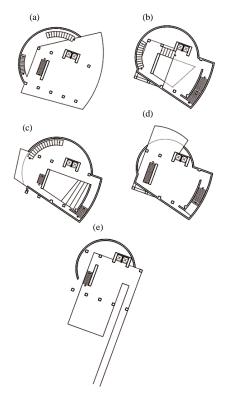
Floor plans; a) Ist floor plan; b) 2nd floor plan; c) 3rd floor; d) 4th floor and e) 5th floor plan
